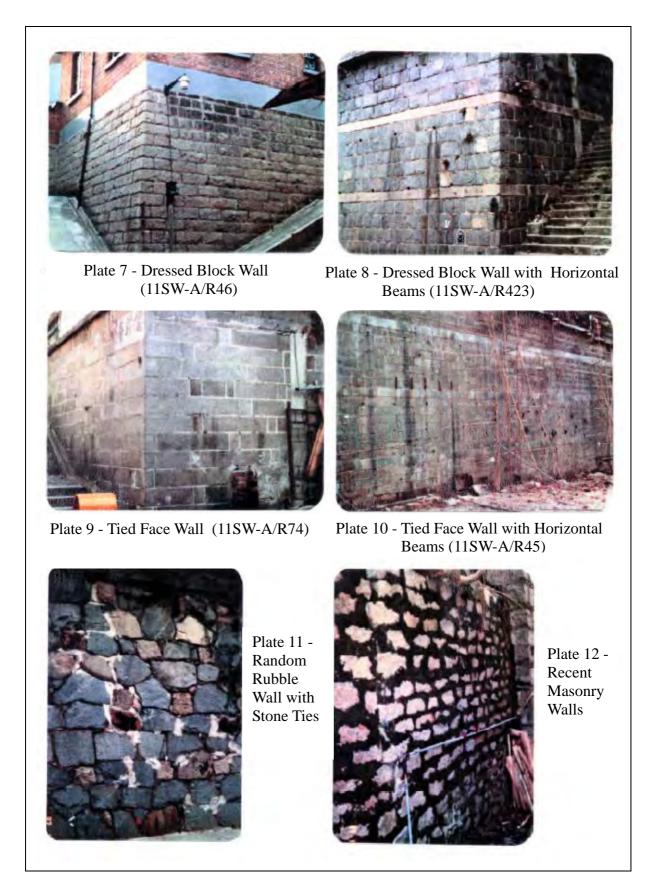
Illustrative Examples of Different Types of Masonry Wall in Hong Kong (Chan, 1996) (Sheet 2 of 3)
